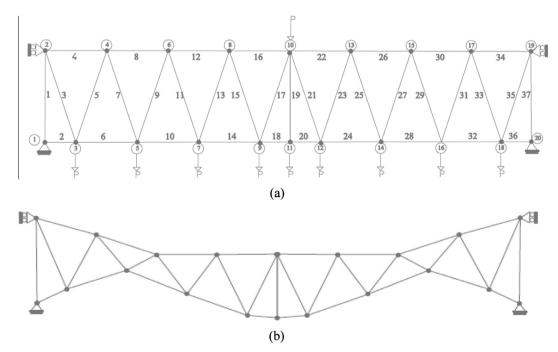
(a) Schematic of the Forth truss bridge and (b) optimized layout of the forth bridge.
